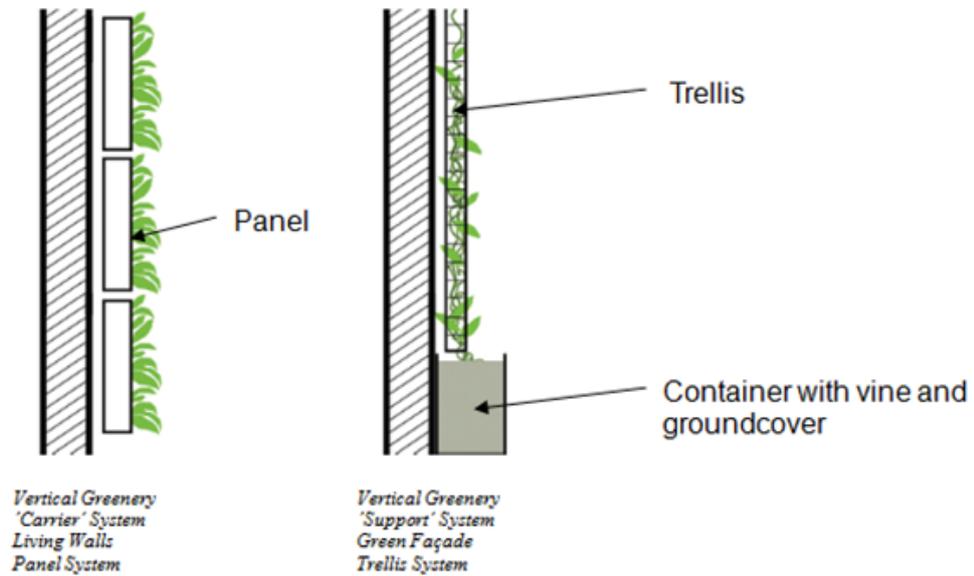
Living Wall and Green Façade Systems definitions (Wong, 2009).
